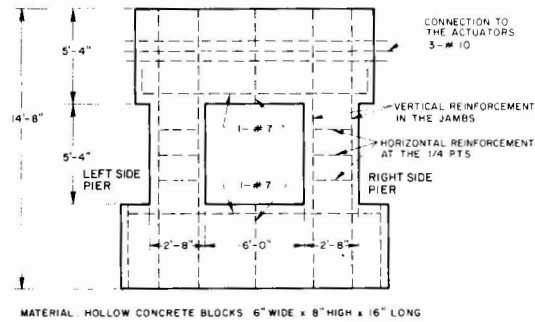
TYPICAL DOUBLE PIER TEST SPECIMEN
